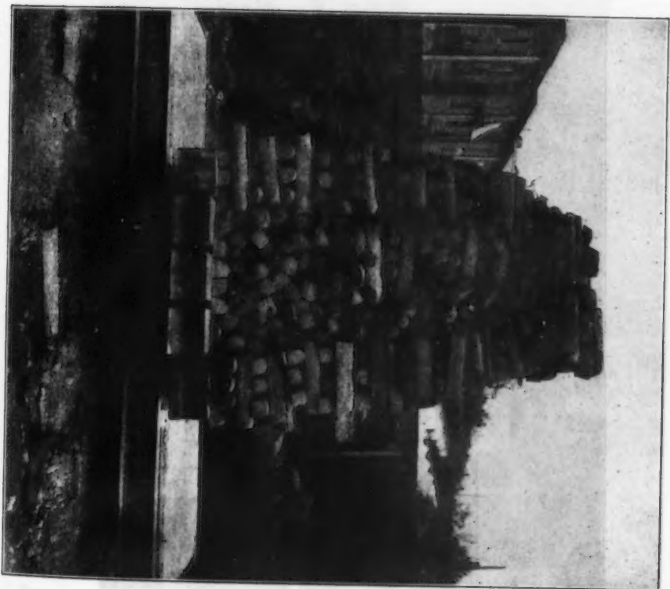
LOADING WITH PIG IRON SEATED IN A SOLID MASS. NOTE EVIDENCES OF ARCH ACTION AND LOAD TO SUPPORTING STRUCTURE.
